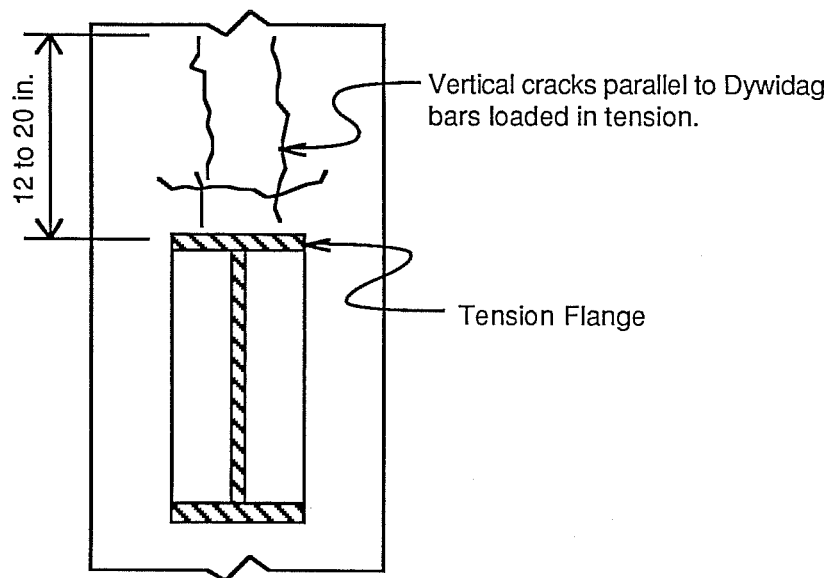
Cracking in Specimens 11 and 17 (Dywidag bars)
